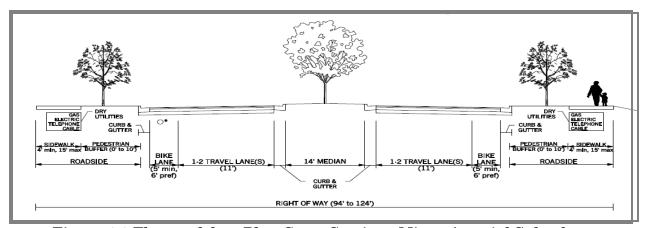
Thoroughfare Plan Cross Section: Minor Arterial Suburban
